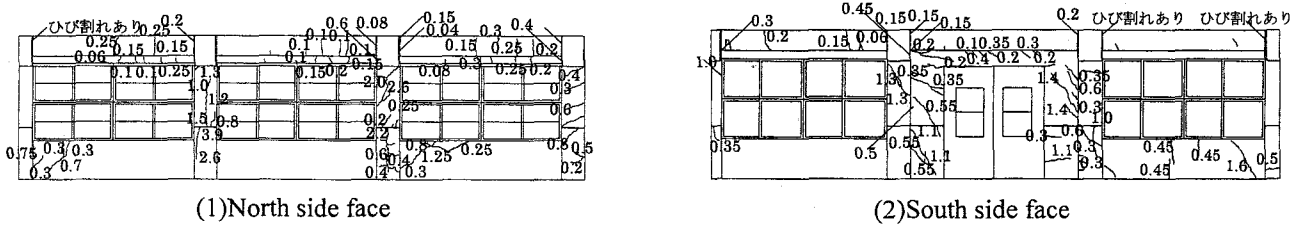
Concrete crack conditions of south and north side faces of hydro-mechanics laboratory room
